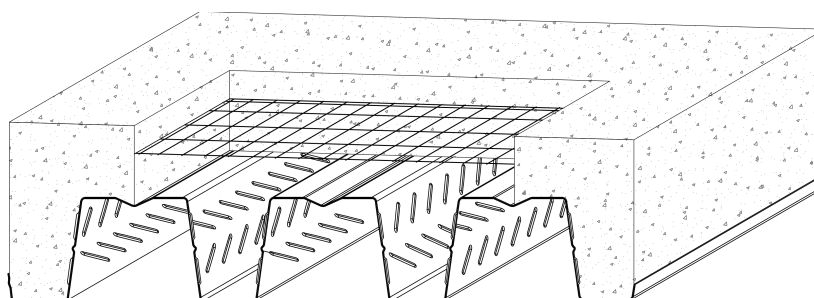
A standard steel-concrete slab incorporating a trapezoidal metal deck.
